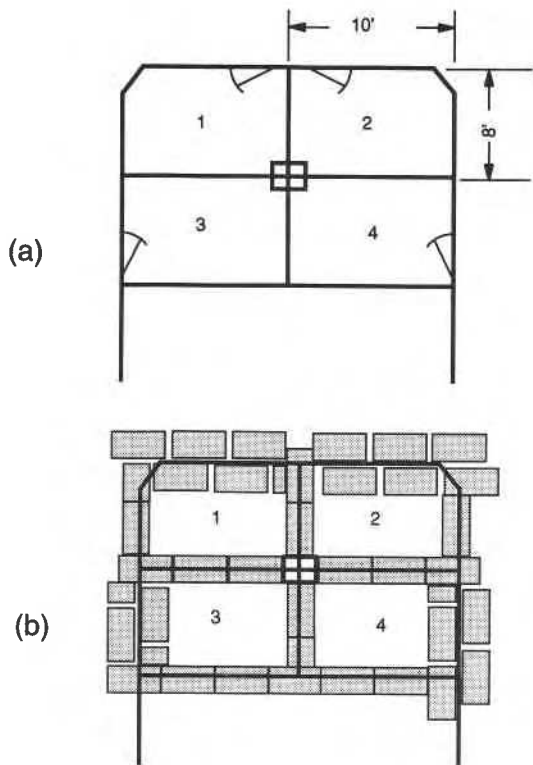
Plan view of offices (a) before blocking wall installation and (b) after installation of absorptive batt blocking walls.
